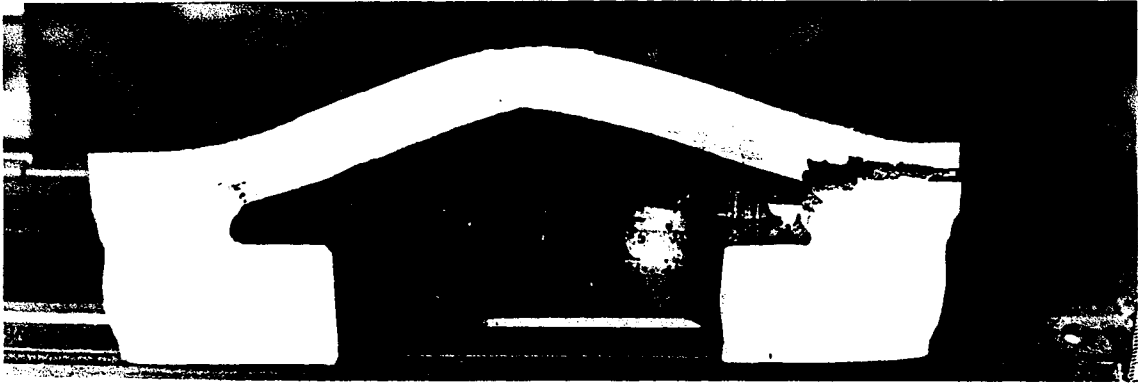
Longitudinal section of bending specimen 1 after failure
